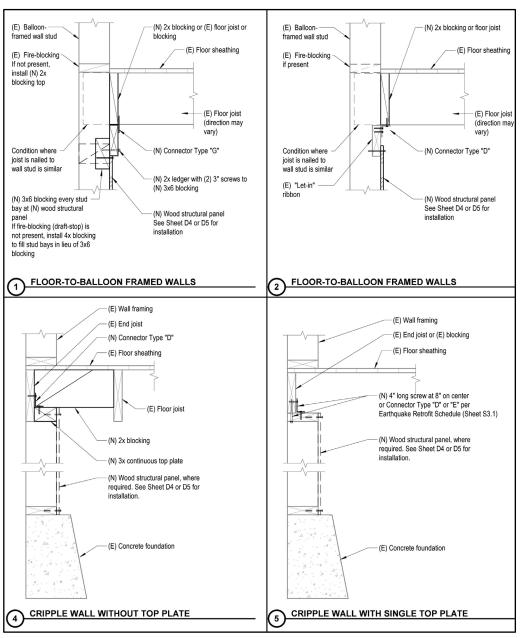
Floor framing to cripple wall connection details. Sheet D3.1.
